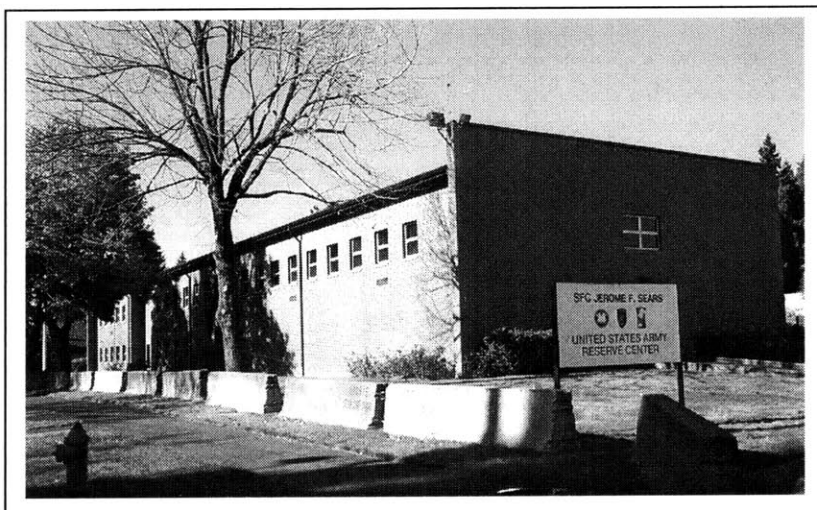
Example of traditional American structural blast design (Einstein, 2003).
